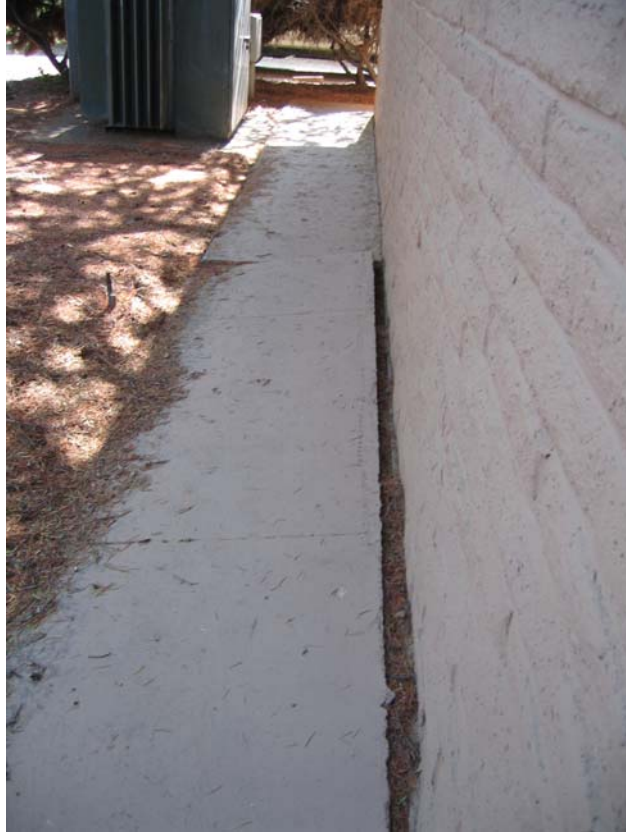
Mary Carson Pump Station Building – Rotated Sidewalk
